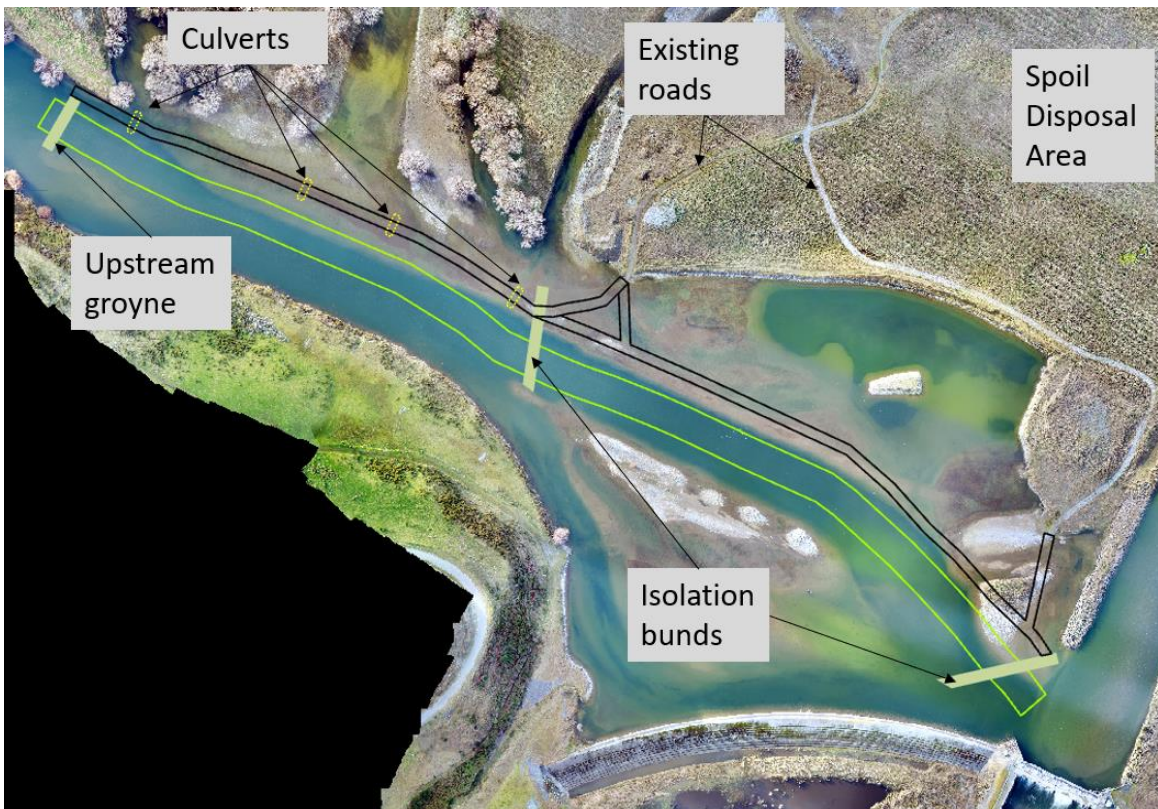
Anticipated extent of haul roads in black outline on true-left channel bank connecting the channel edge to existing access roads and spoil disposal area.
